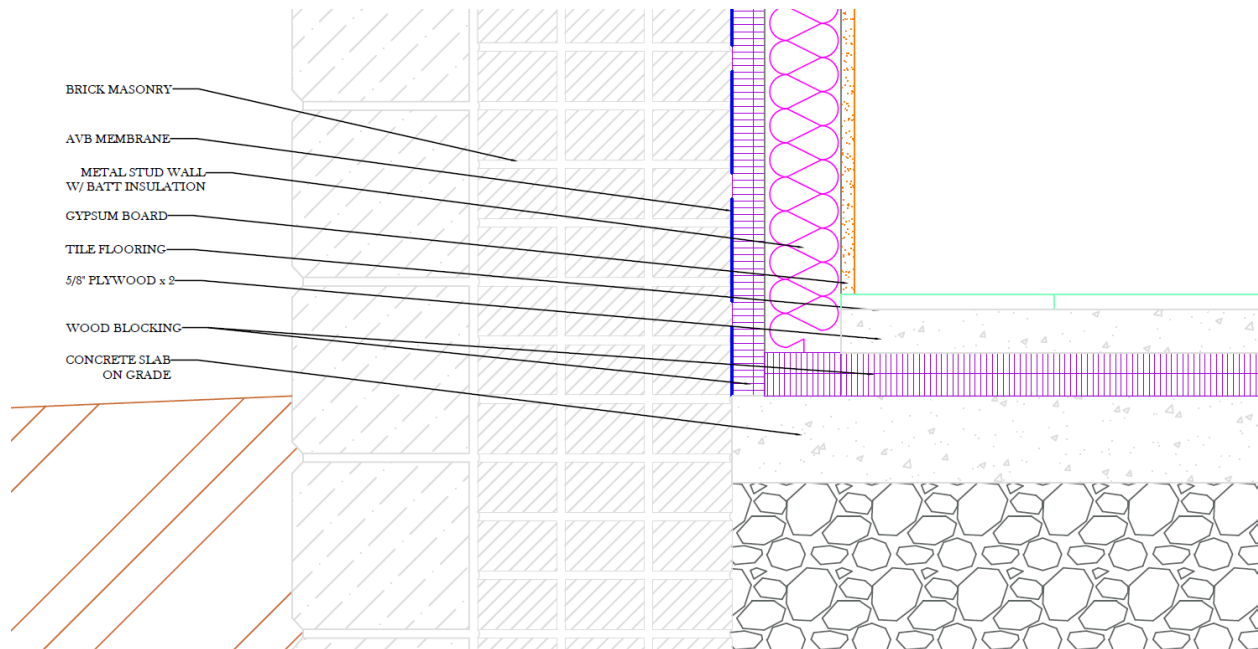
Stratton Hall Schematic Drawing 6-Wall to Slab on Grade Section
